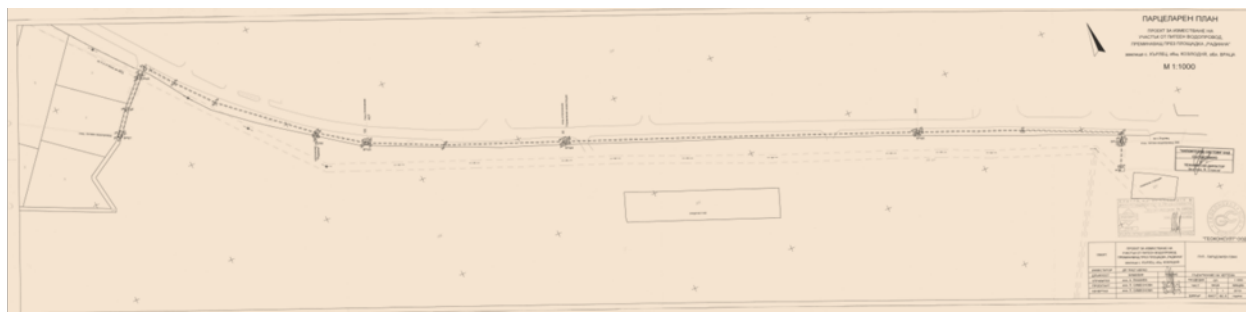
SCHEME OF MOVING A DRINKING WATER CONDUIT OUTSIDE RADIANA SITE
